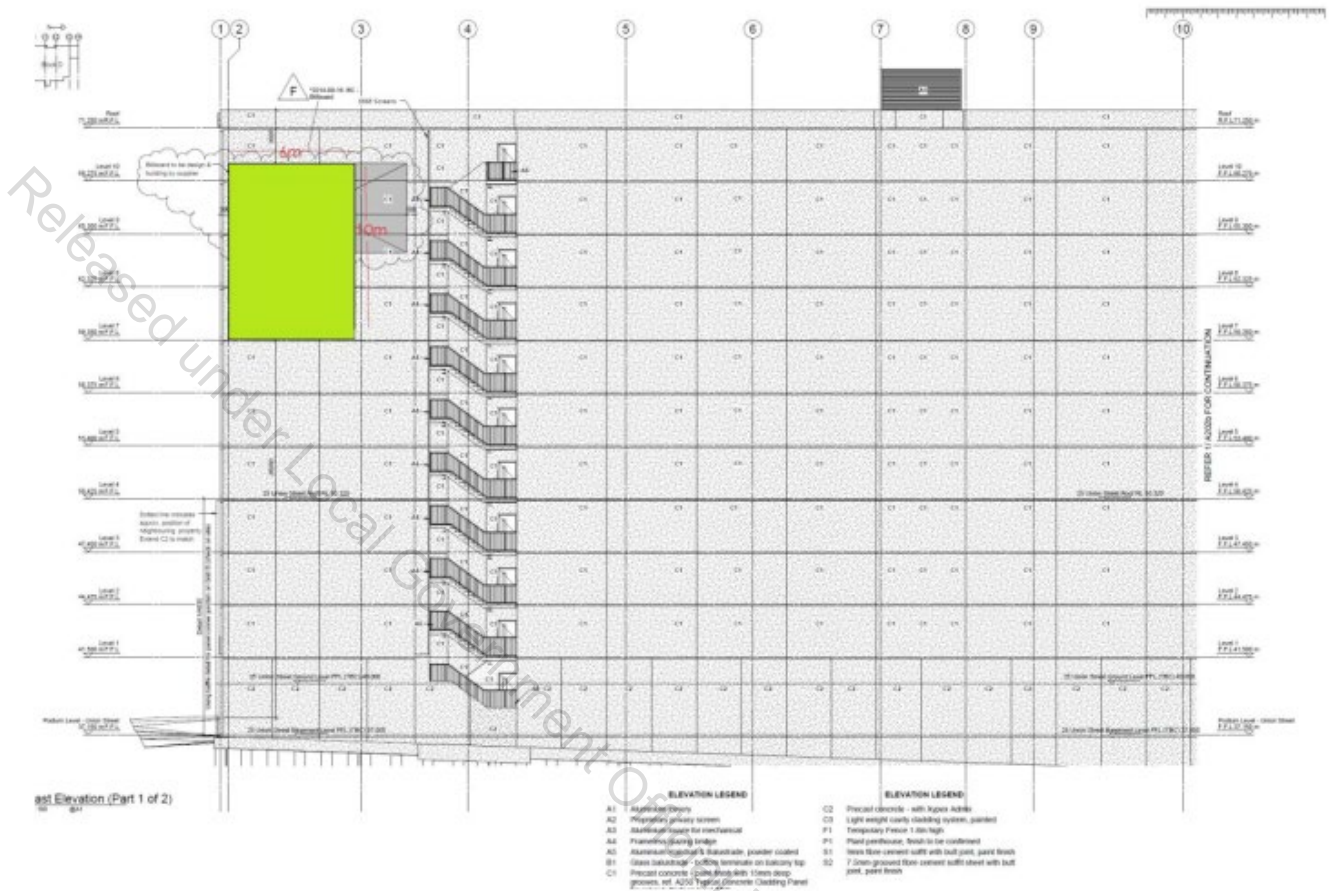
Cross section view of position of the proposed digital signboard on the south facing façade of the building at 27 Union Street (Source: Applicant).
